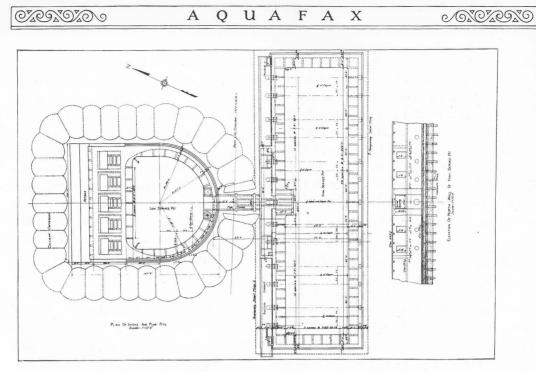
Plate II: Plan of the pump pits and intake, showing also the plan of the cofferdam.
